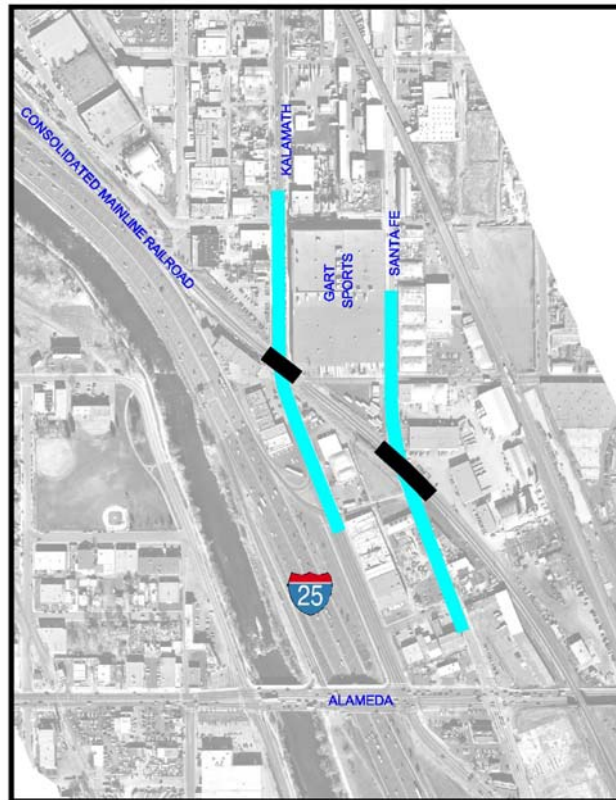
System Alternative 1, Santa Fe Drive and Kalamath Street Grade Separation
